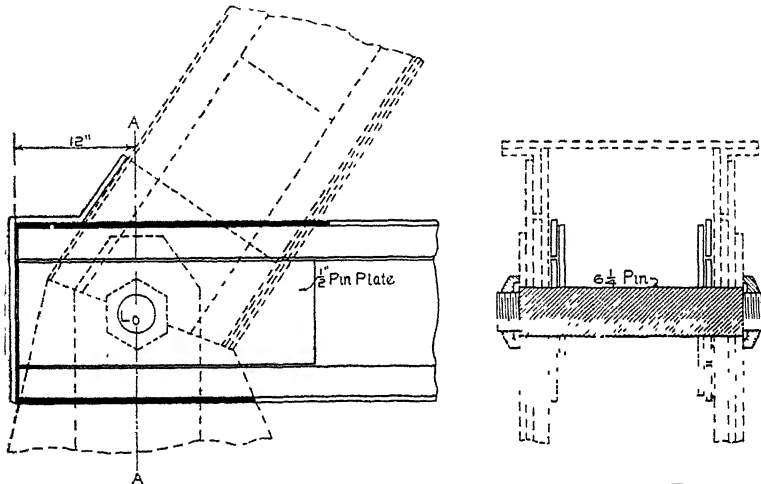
Elevation and Section Showing Pin Connection at End of Truss.
